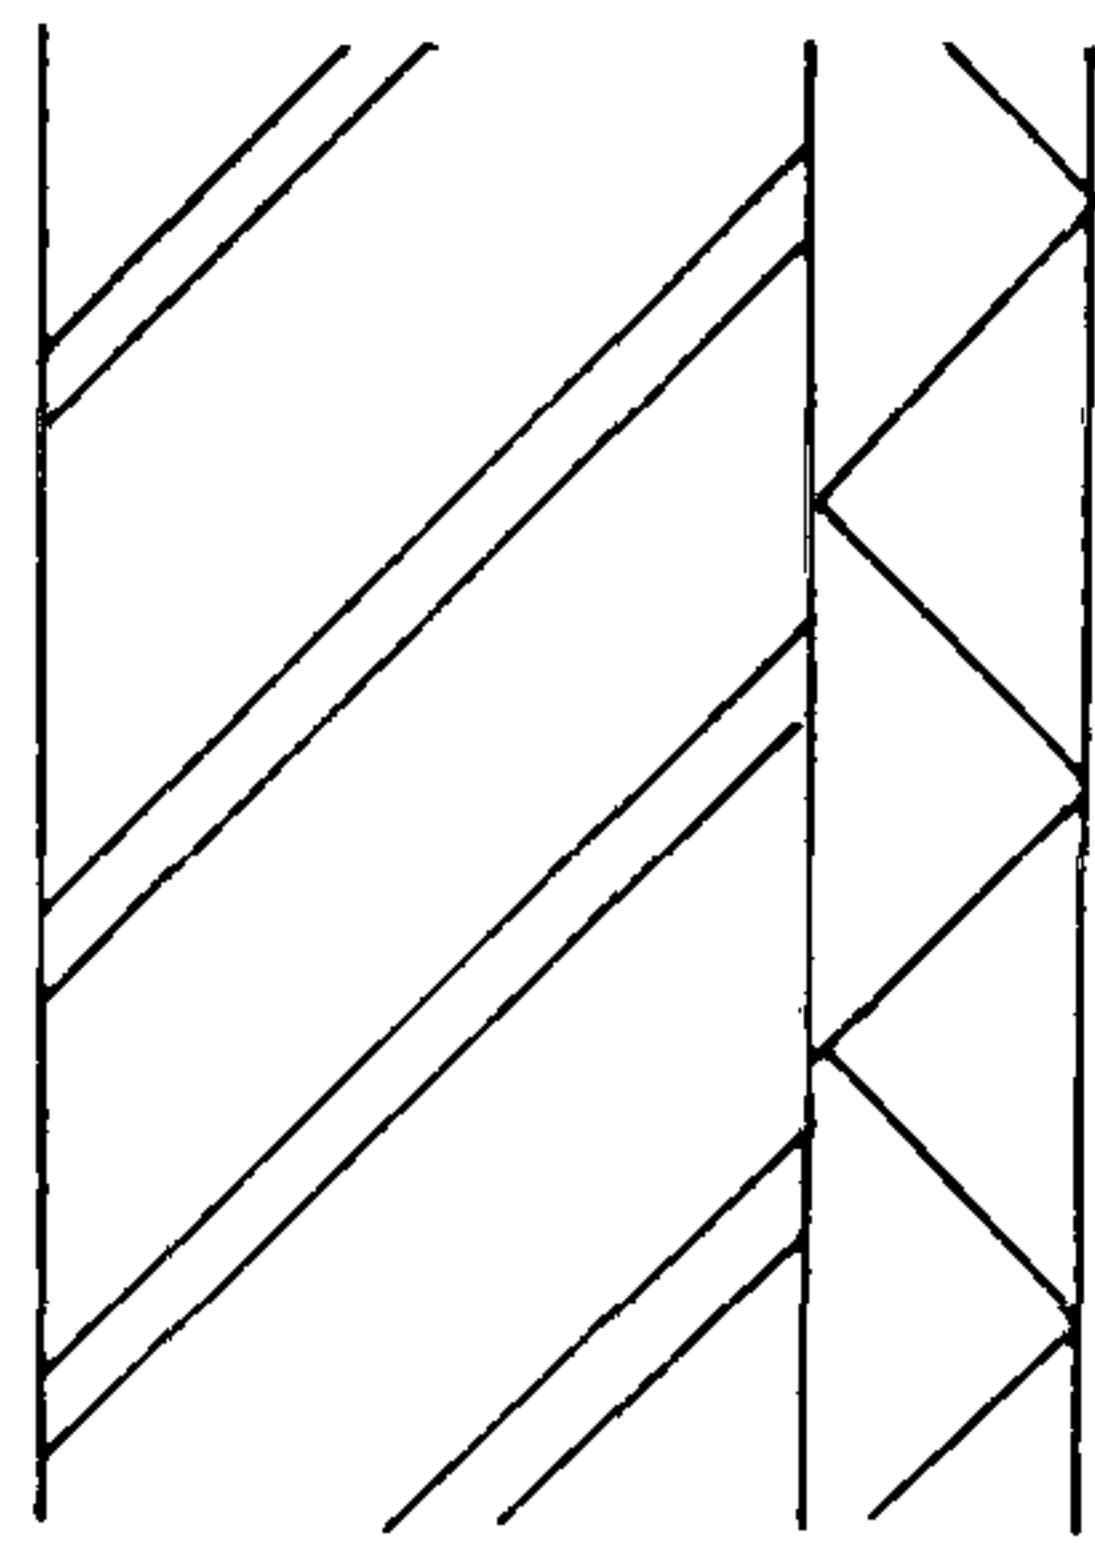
SOLID BRICK WALL: INSIDE INSULATION
